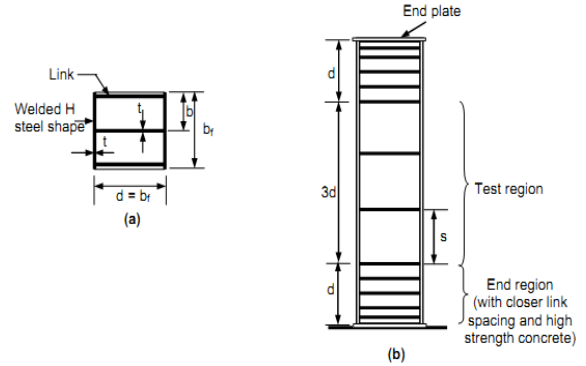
Typical PEC Test Column, (a) Cross-section, (b) Elevation
